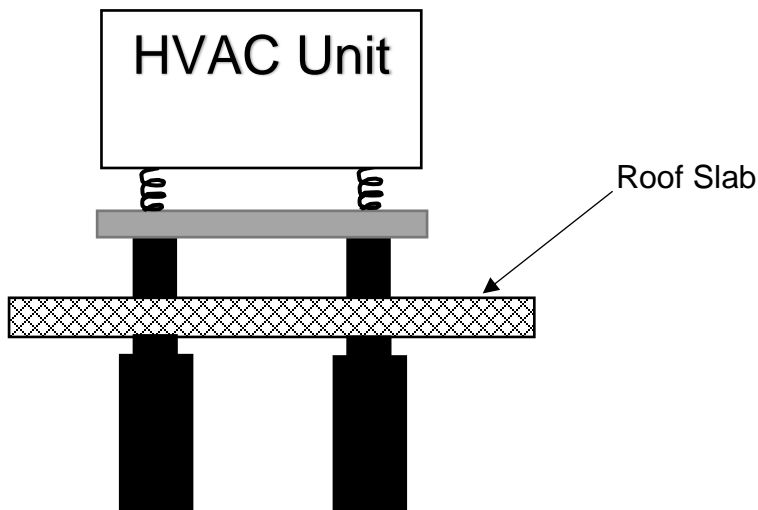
HVAC unit reinstalled with extra stiffening slab.
